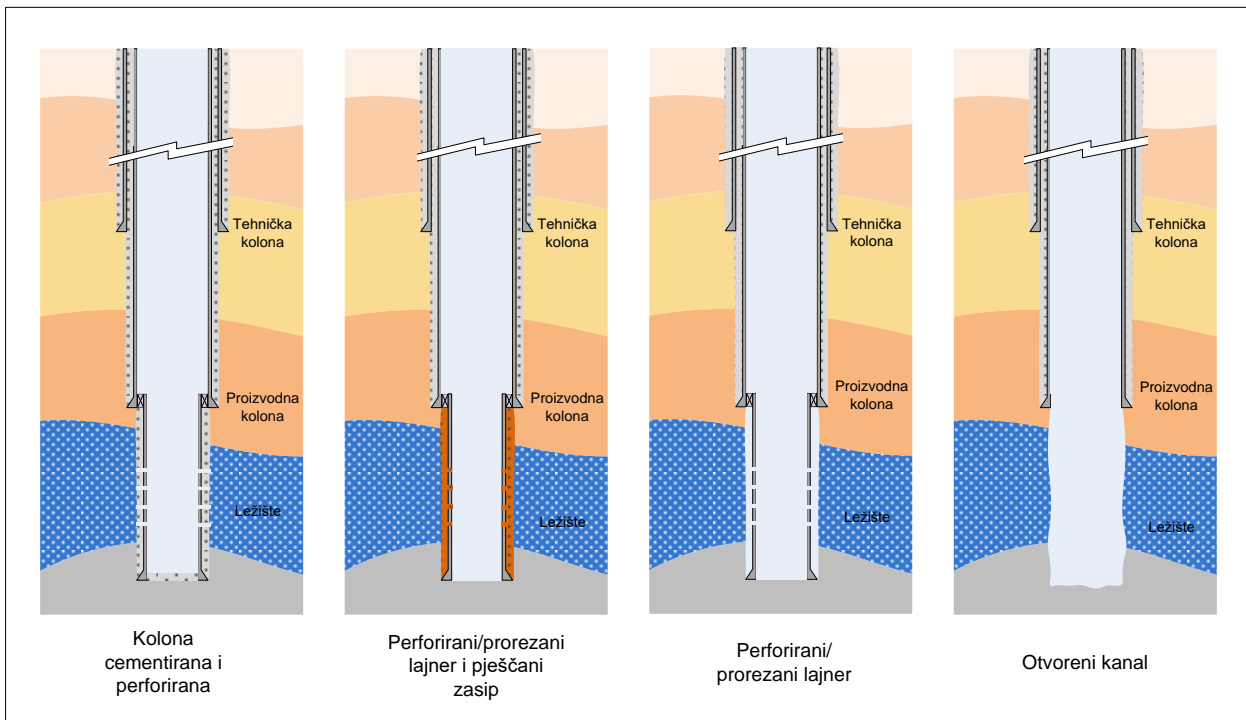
Examples of geothermal well constructions (Gaurina, 2022)
